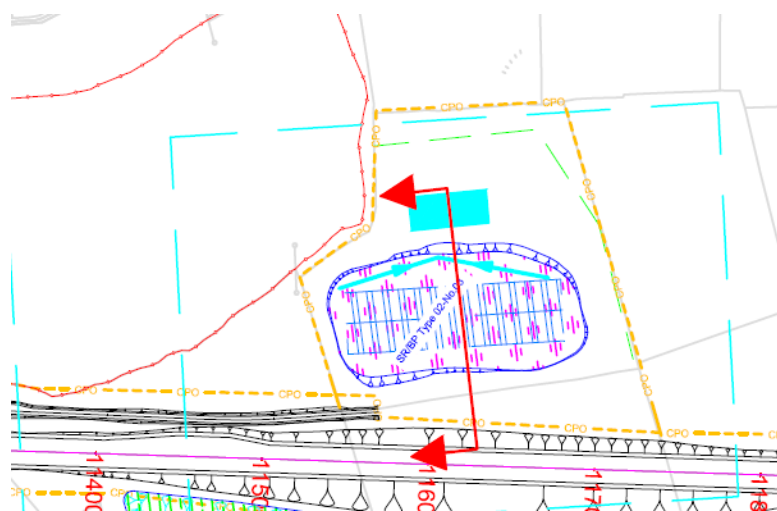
Borrow Pit site outlined in dashed blue (Source: Sligo Co. Co.)
